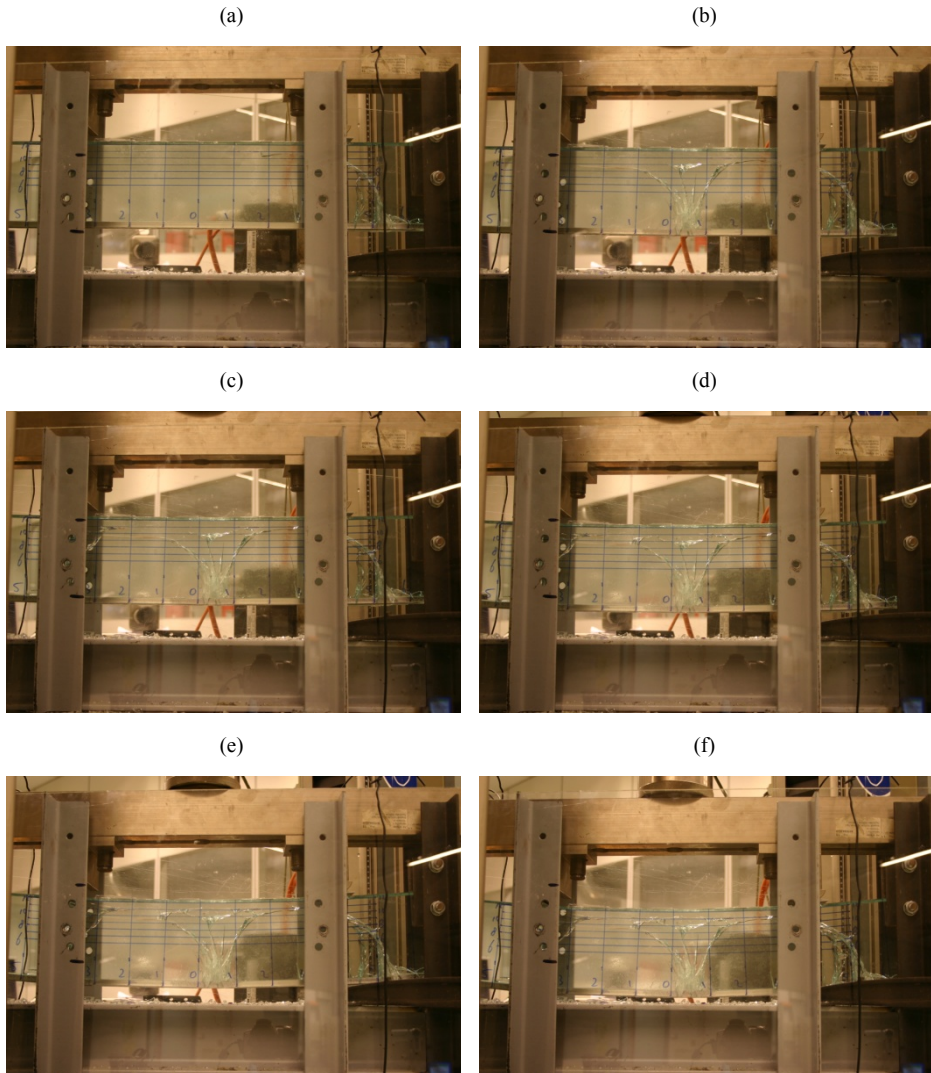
Photo sequence of an exemplary bending test on a 1.5 m GB-bonded reinforced glass beam, with hollow section reinforcement
